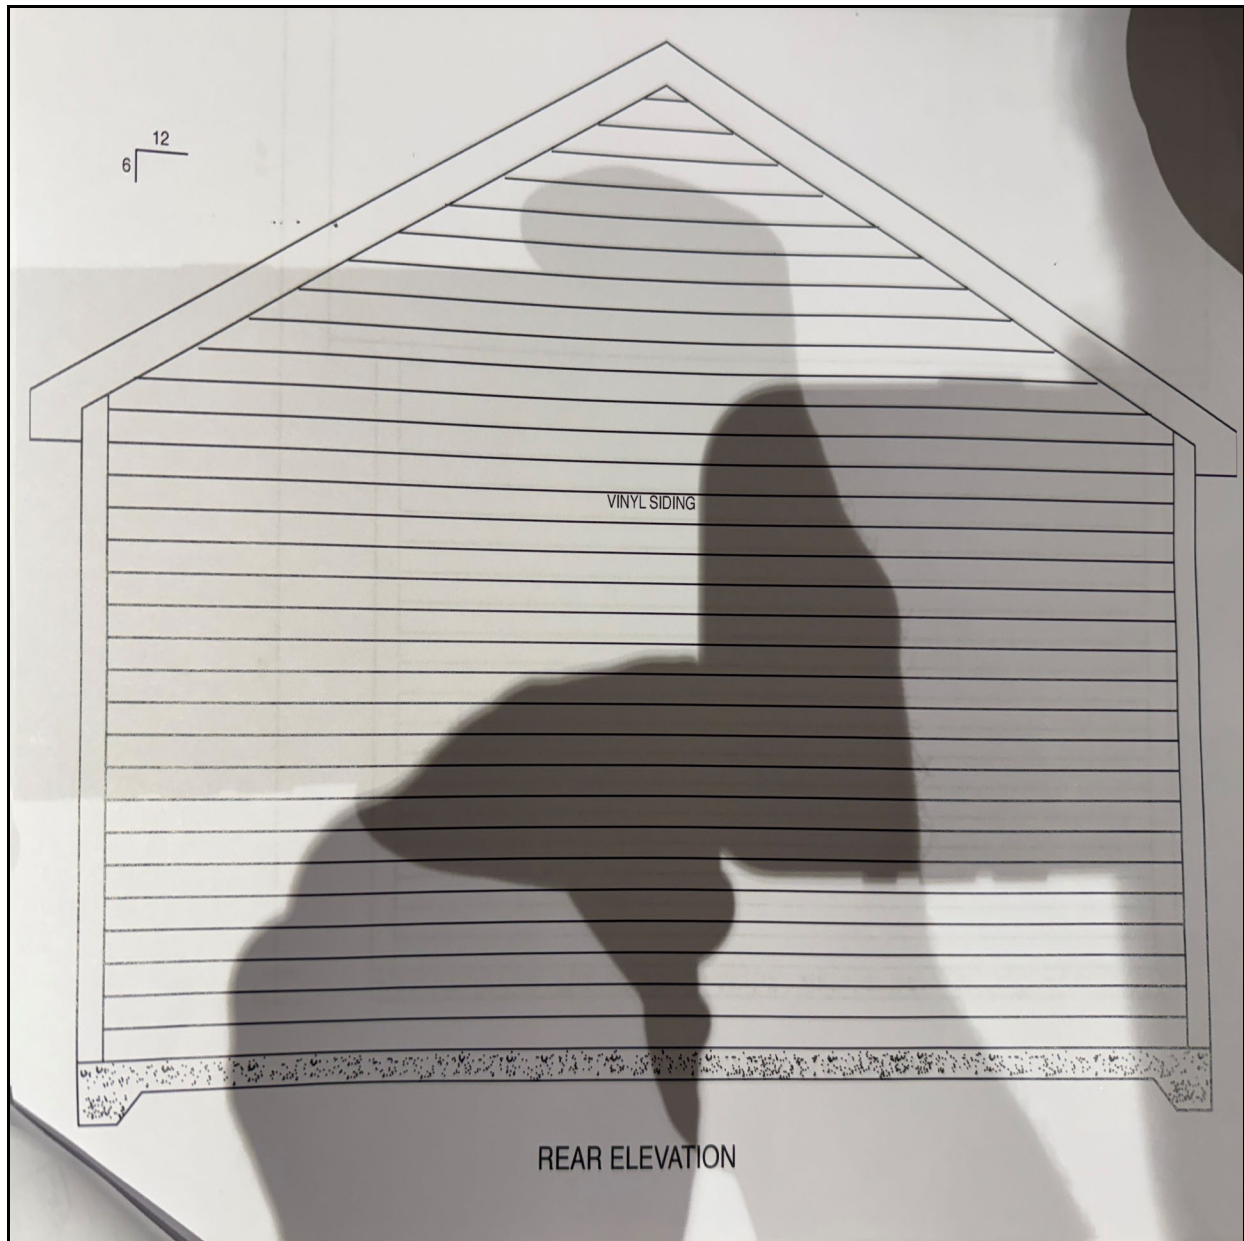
Rear elevation of the proposed garage (c/o Owner).
